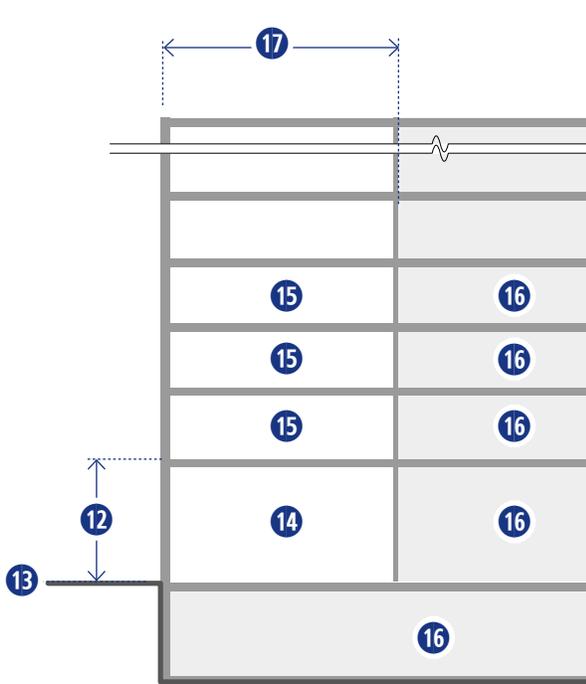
Shopfront Building: Floor-to-Floor Height & Use Requirements
